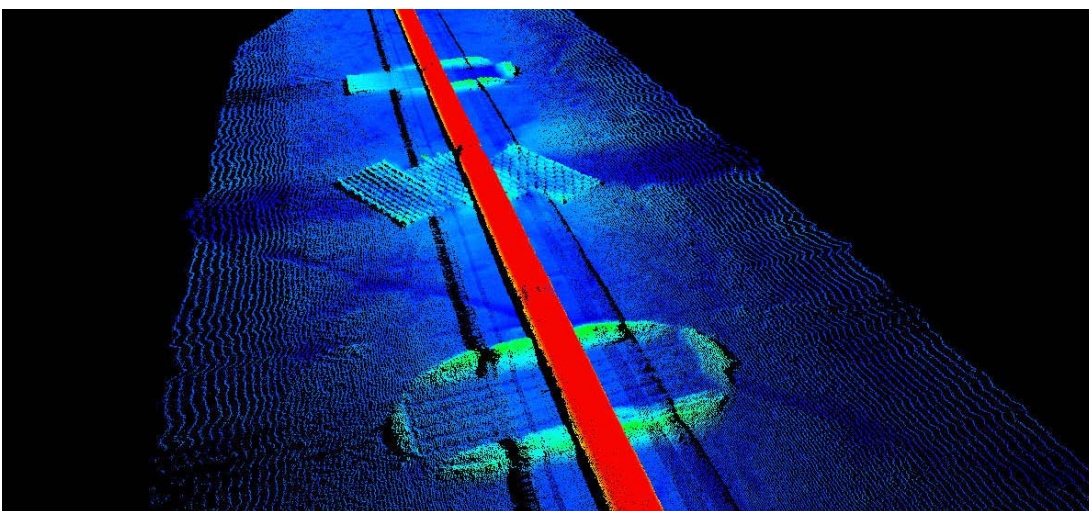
Typical use of concrete mattresses in relation to cable crossings.
